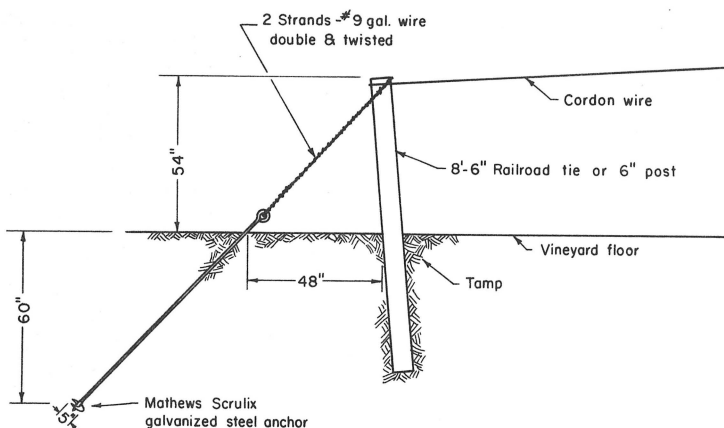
Screw-in' type galvanized steel anchor. Note depth, angle of guy, and size.
